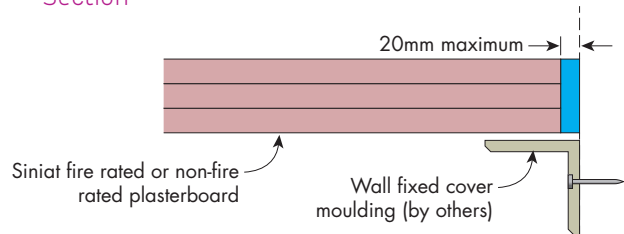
Finishing Detail - Bare finish with Sealant
